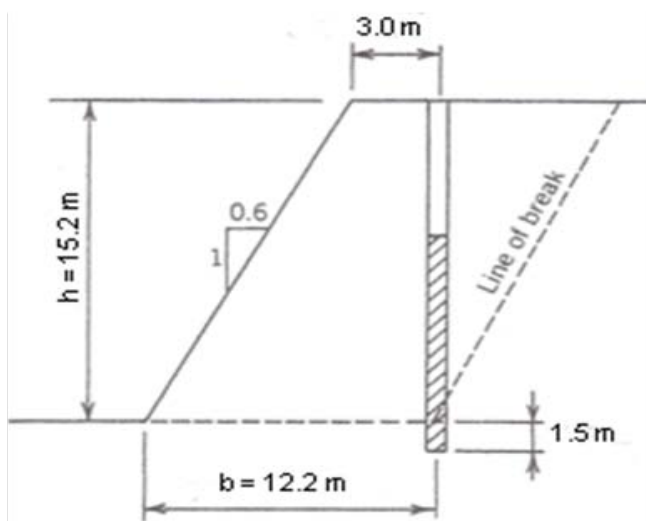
Design of Surface Blast, Showing Bank Cross Section and Charged Drillhole
